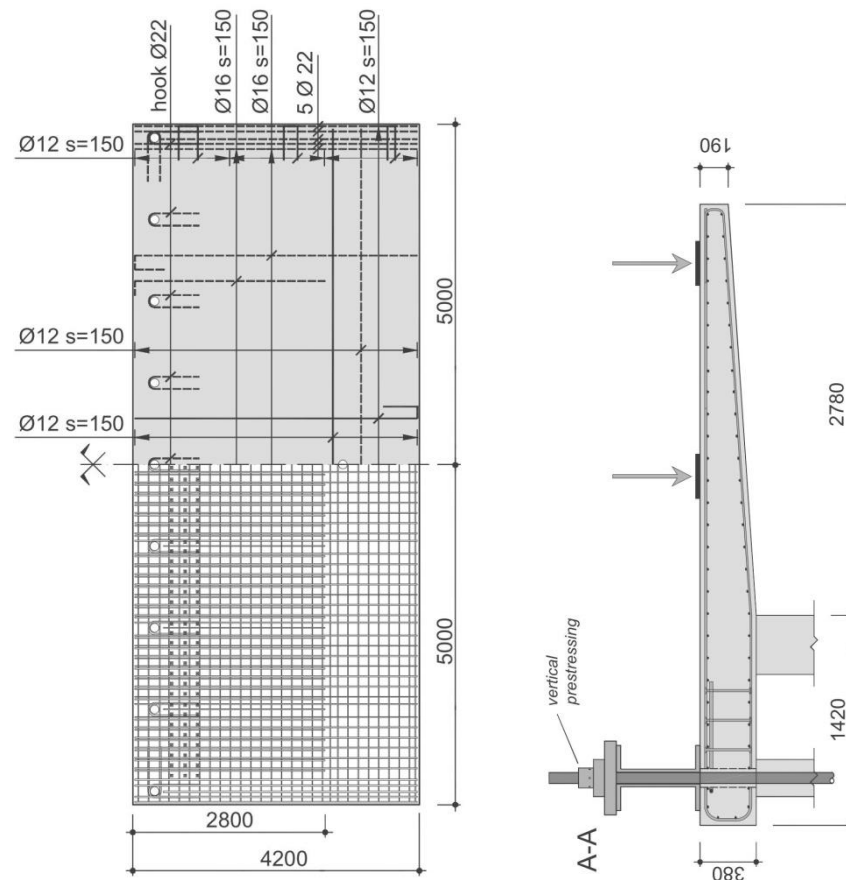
Case RS2. Geometry and reinforcement layout (Rodrigues 2007)
